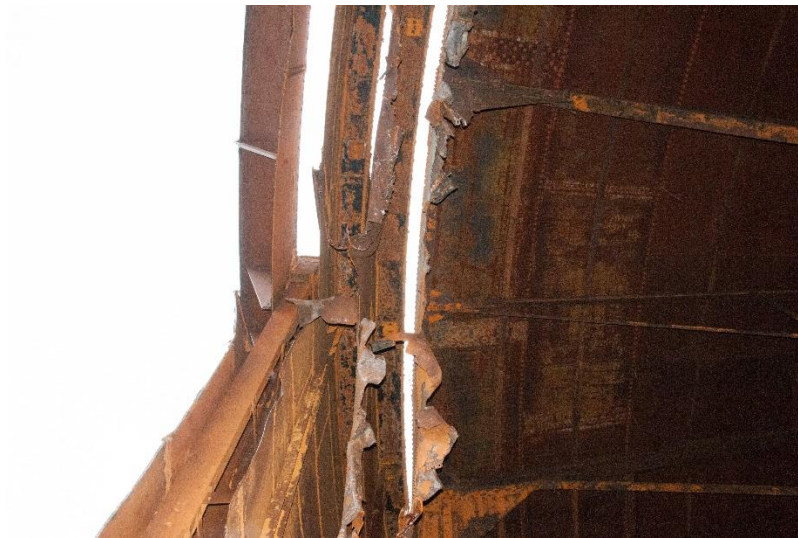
View looking up, showing the crown top curb and section of lifts and tank with grips in place
